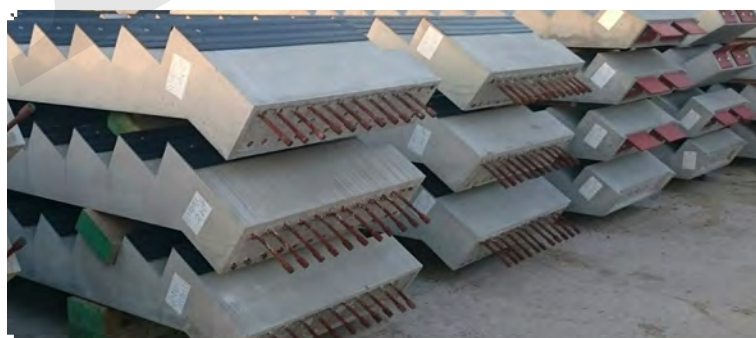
Precast stair flights in storage with end details as shown in previous Fig. 8-5 and 8-6.
